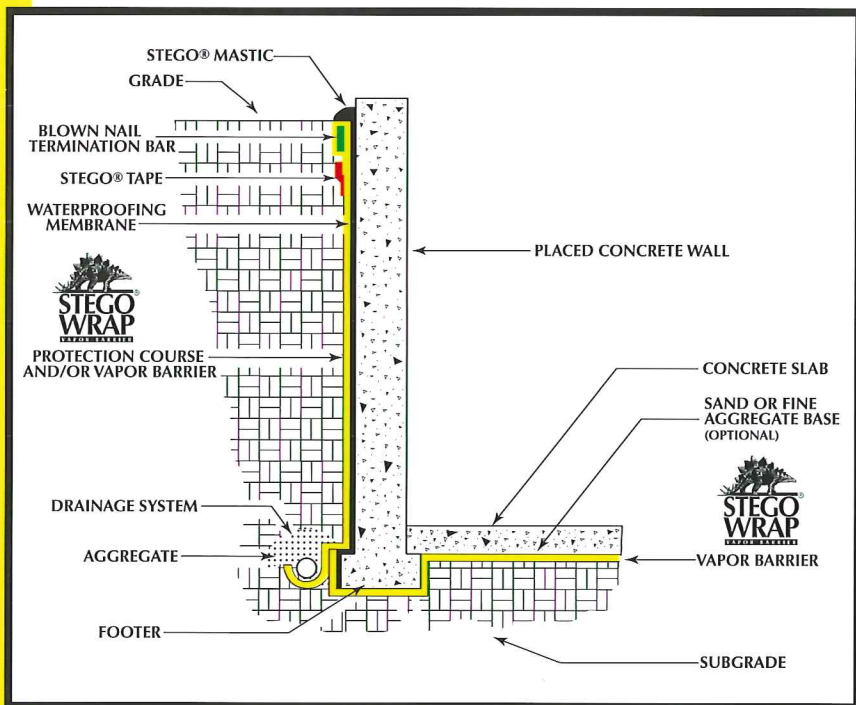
OPTIONAL INSTALLATION FOR FOOTING ENCAPSULATION AND WATERPROOFING TIE-IN
